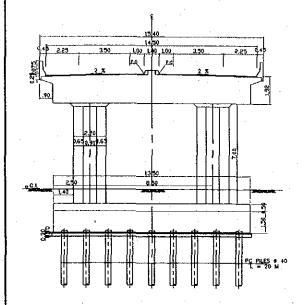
(1) Access Road - Cross Section of Flyover (Option 1)
